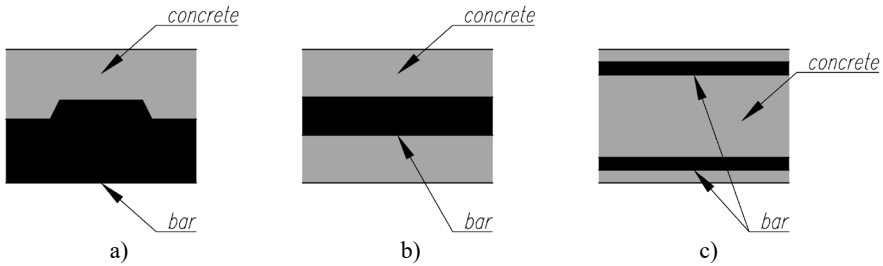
Scales of the bond observation: a) rib scale, b) bar scale, c) member scale. *Source: own study
